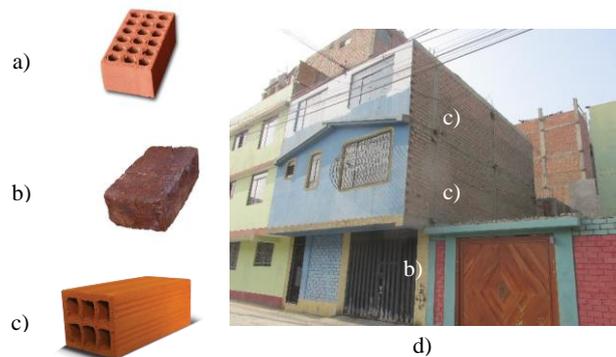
Types of bricks used in non-engineered confined masonry dwellings: a) hollow, b) solid c) tubular bricks d) Solid bricks used in first floor and tubular bricks in upper floors.
